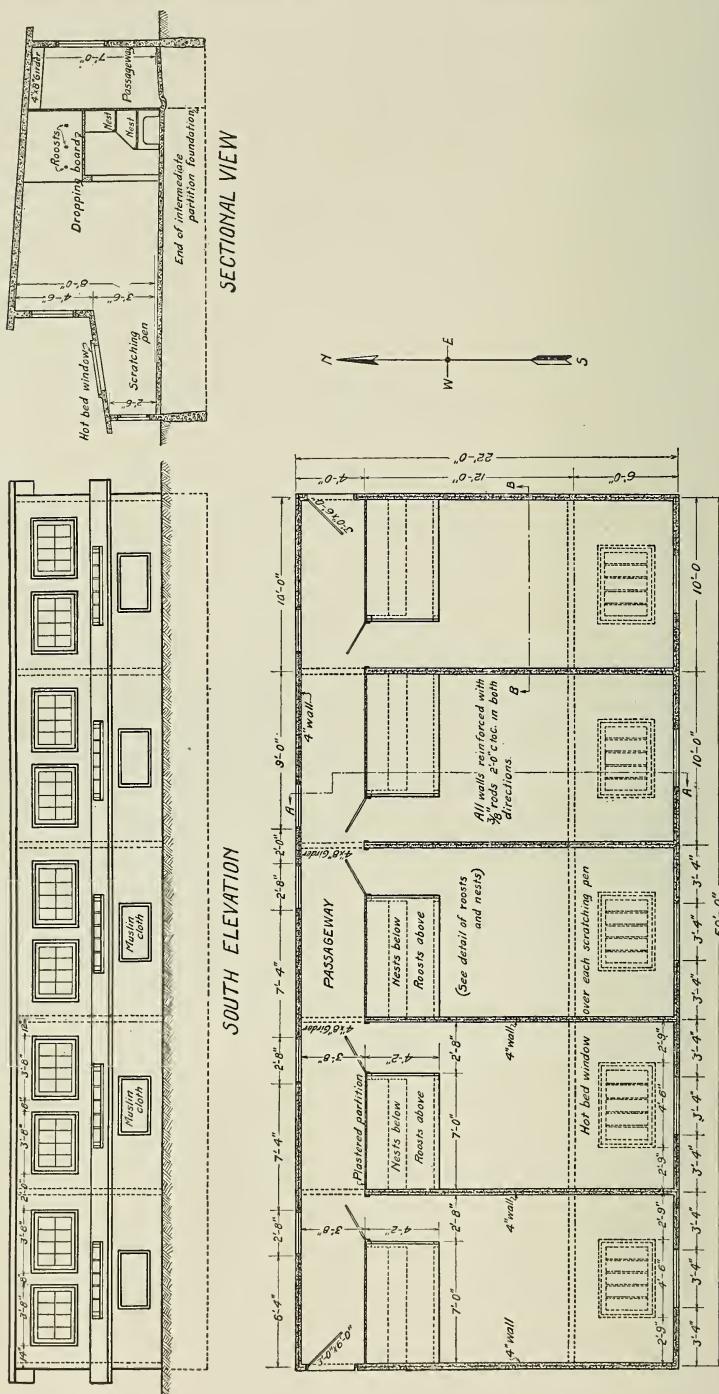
Reinforced Concrete Poultry House designed to accommodate several flocks. A fire-proof and vermin-proof structure of the most approved type.
